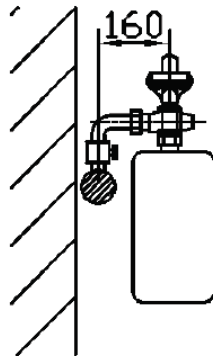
Position of meter outlet pipe in relation to manifold (End view).
